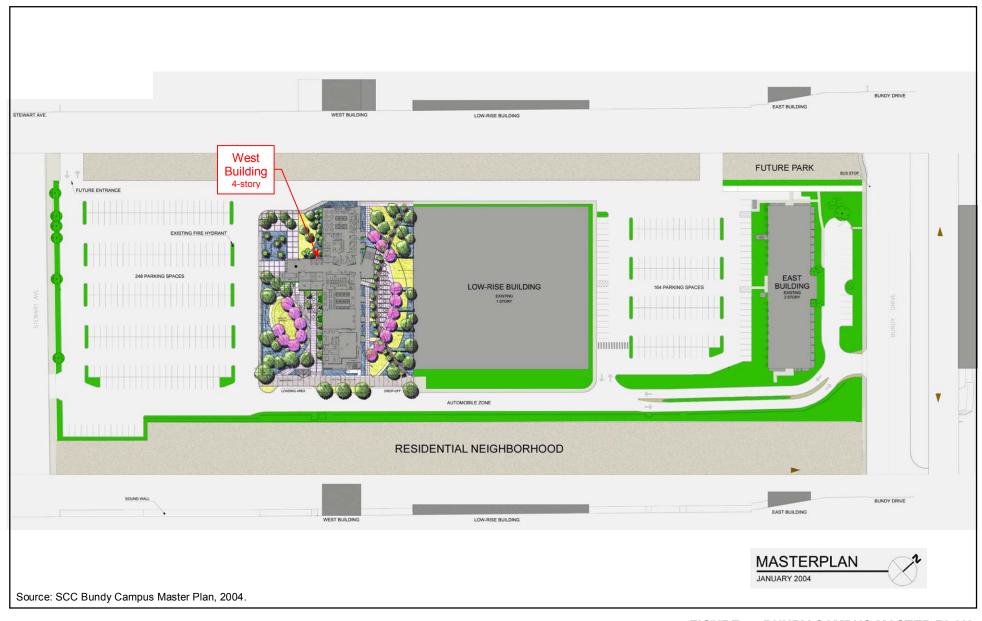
BUNDY CAMPUS MASTER PLAN
